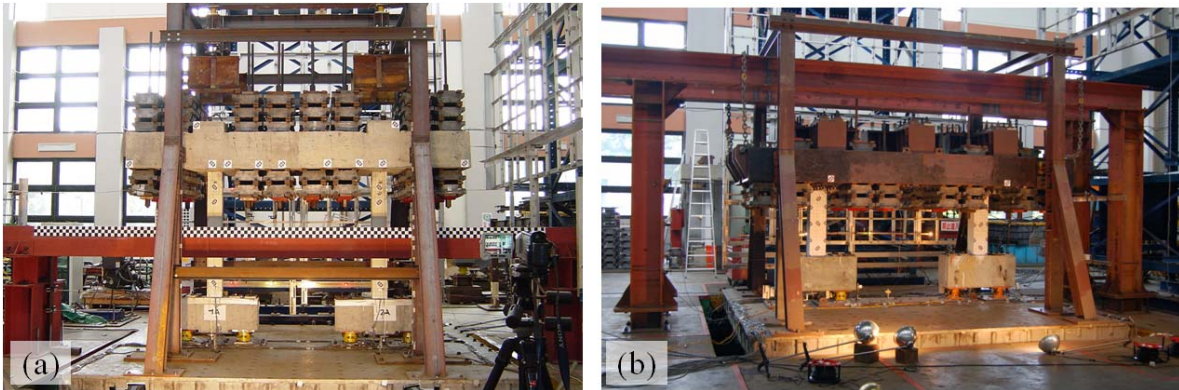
Photographical view of the experimental setup: (a) typical concrete frame; (b) de-attachable steel loading beam on the top of concrete columns.
